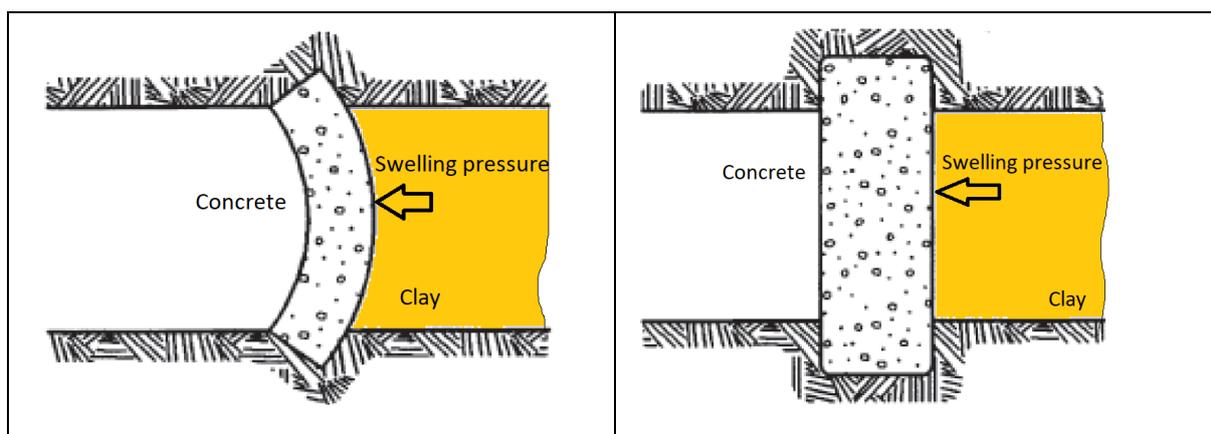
Examples of concrete plug shape (from Auld, 1996) in contact with swelling clay
